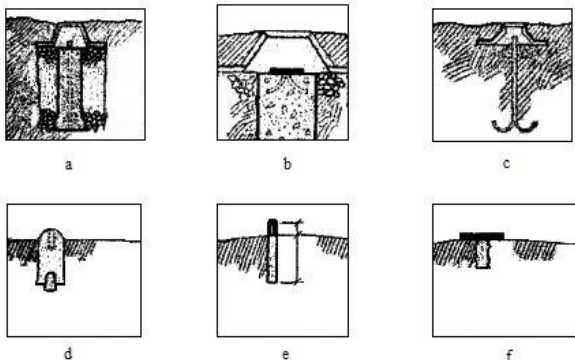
Landmarks; a – peg embedded in concrete; b – steel plate embedded in concrete; c – peg embedded in hard ground; d – metallic piece with landmark, embedded in hard ground; e – metallic peg embedded in hard ground; f – steel plate with pegs, embedded in hard ground.
